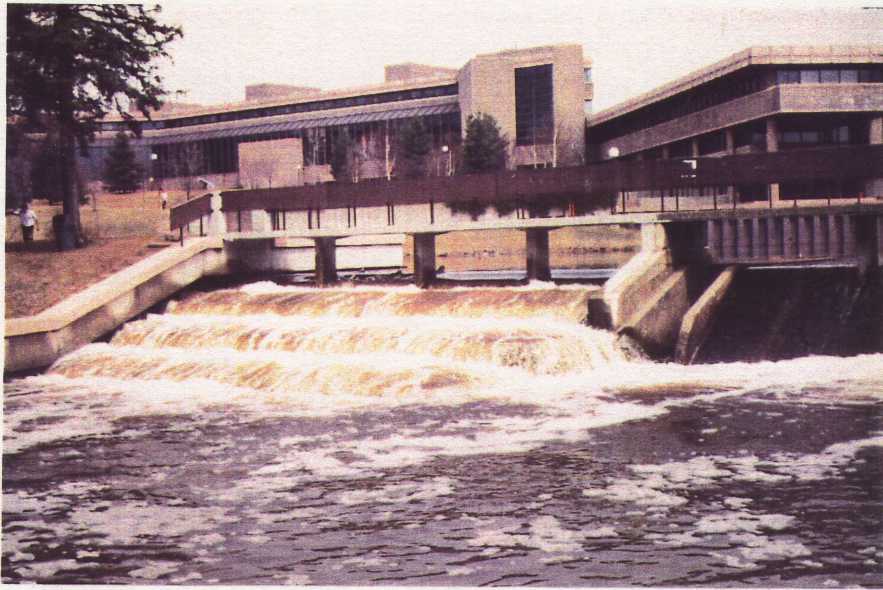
Fishway on the McIntyre River, 25 April 1990. A structure similar to this may be adapted to an existing sluiceway at Boulevard Lake.
